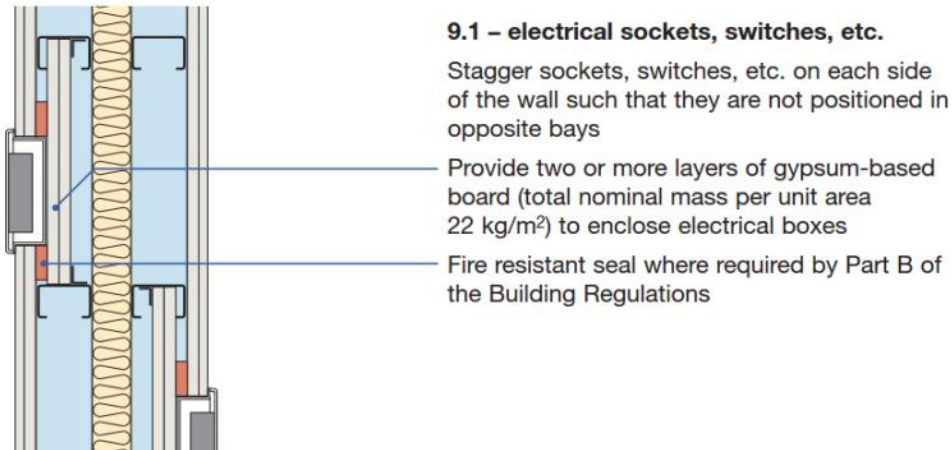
RSD Plan Plasterboard Backing Detailing
